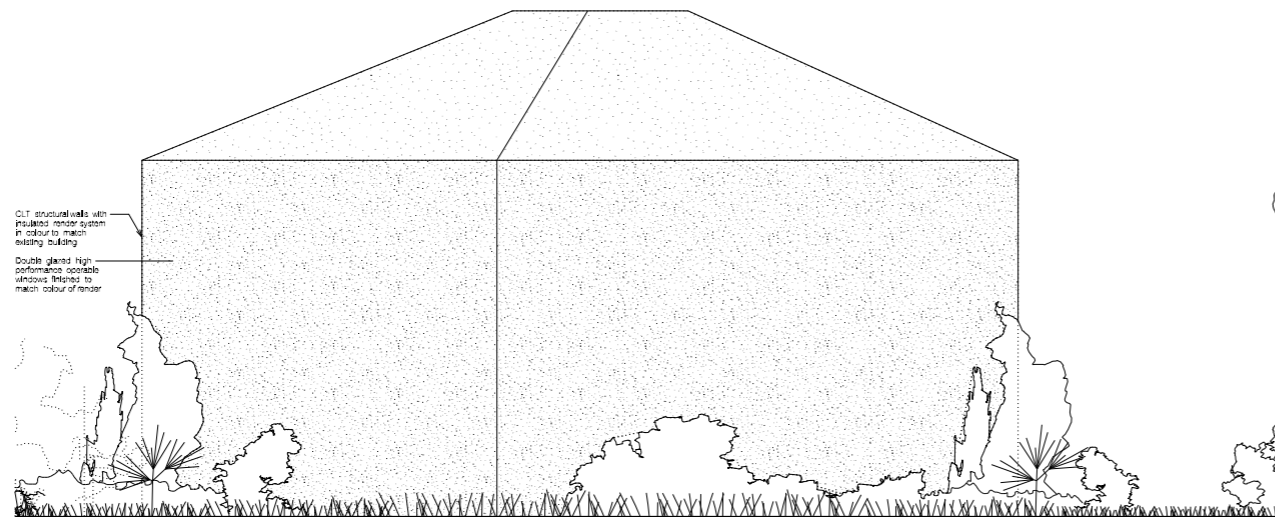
(L) Pre-application north facing 151 Headley Way elevation.
